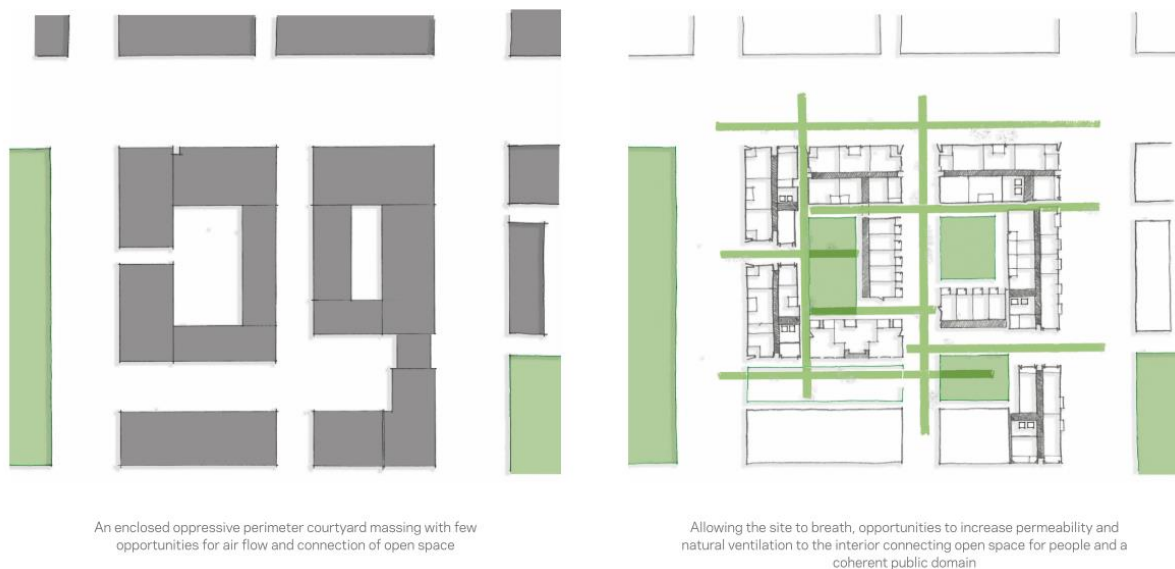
Concept DA building layout (left) vs proposed competition scheme building layout (right)
